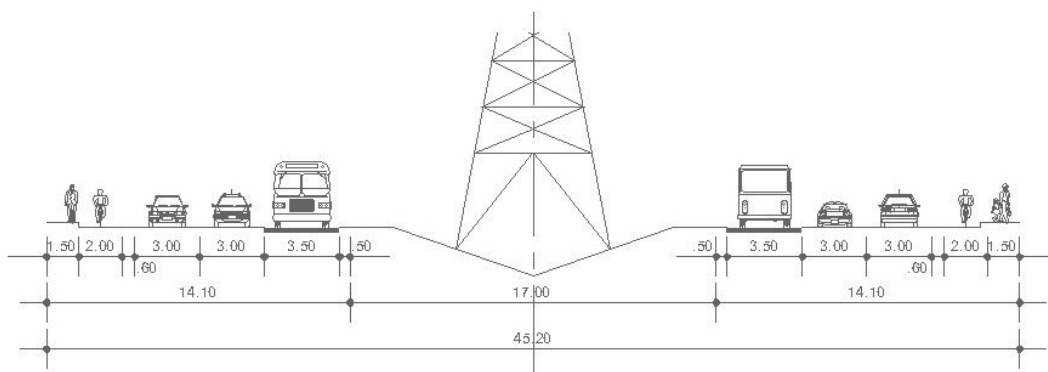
Planned Cross Section of Av. Independência (West Side)
